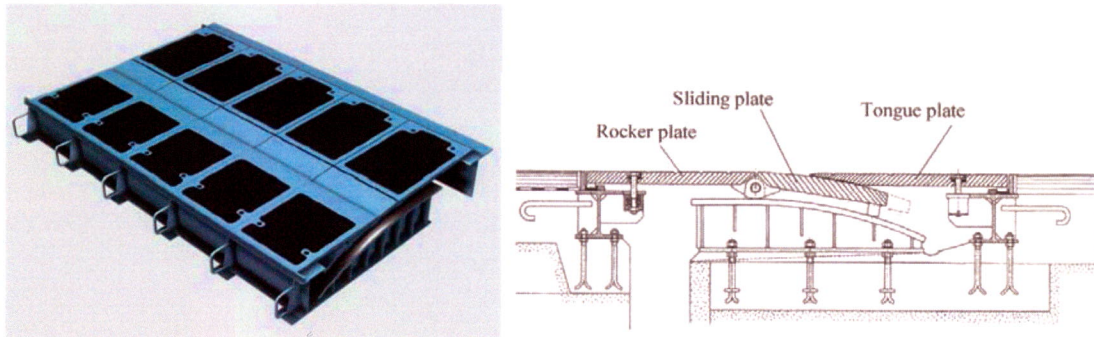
3D view and cross sectional view of a rolling leaf joint.
